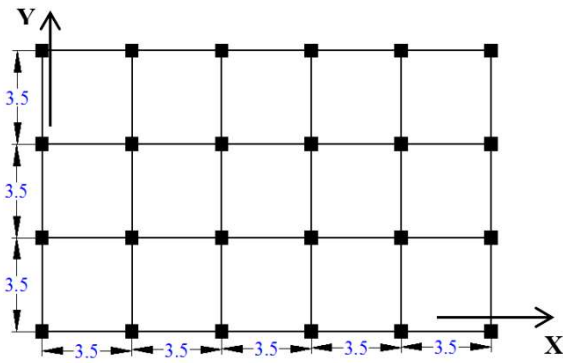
Typical plan of adopted buildings (All dimensions are in metre)
